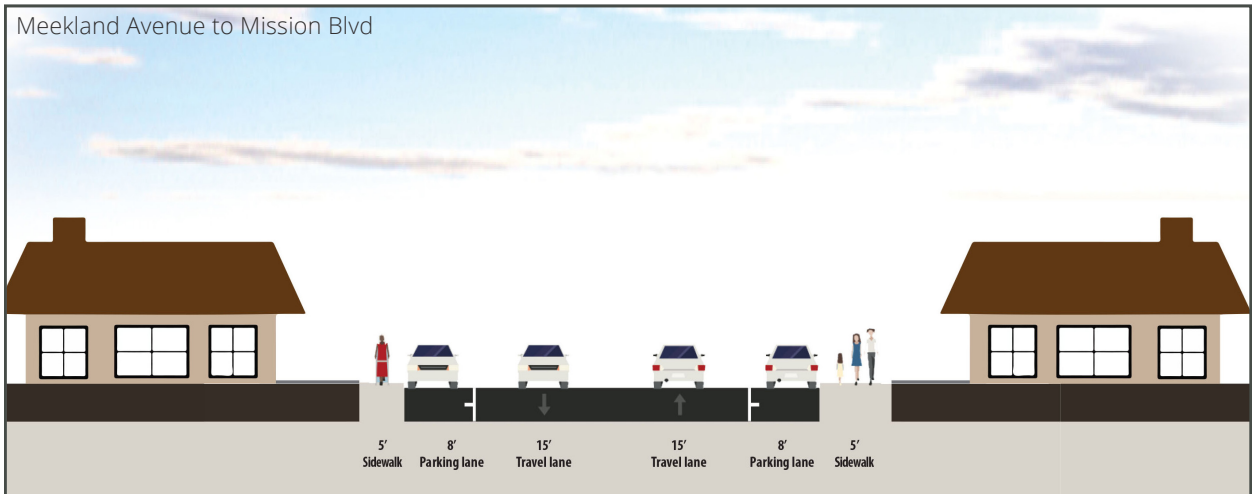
EXISTING CROSS SECTION LEWELLING BLVD
